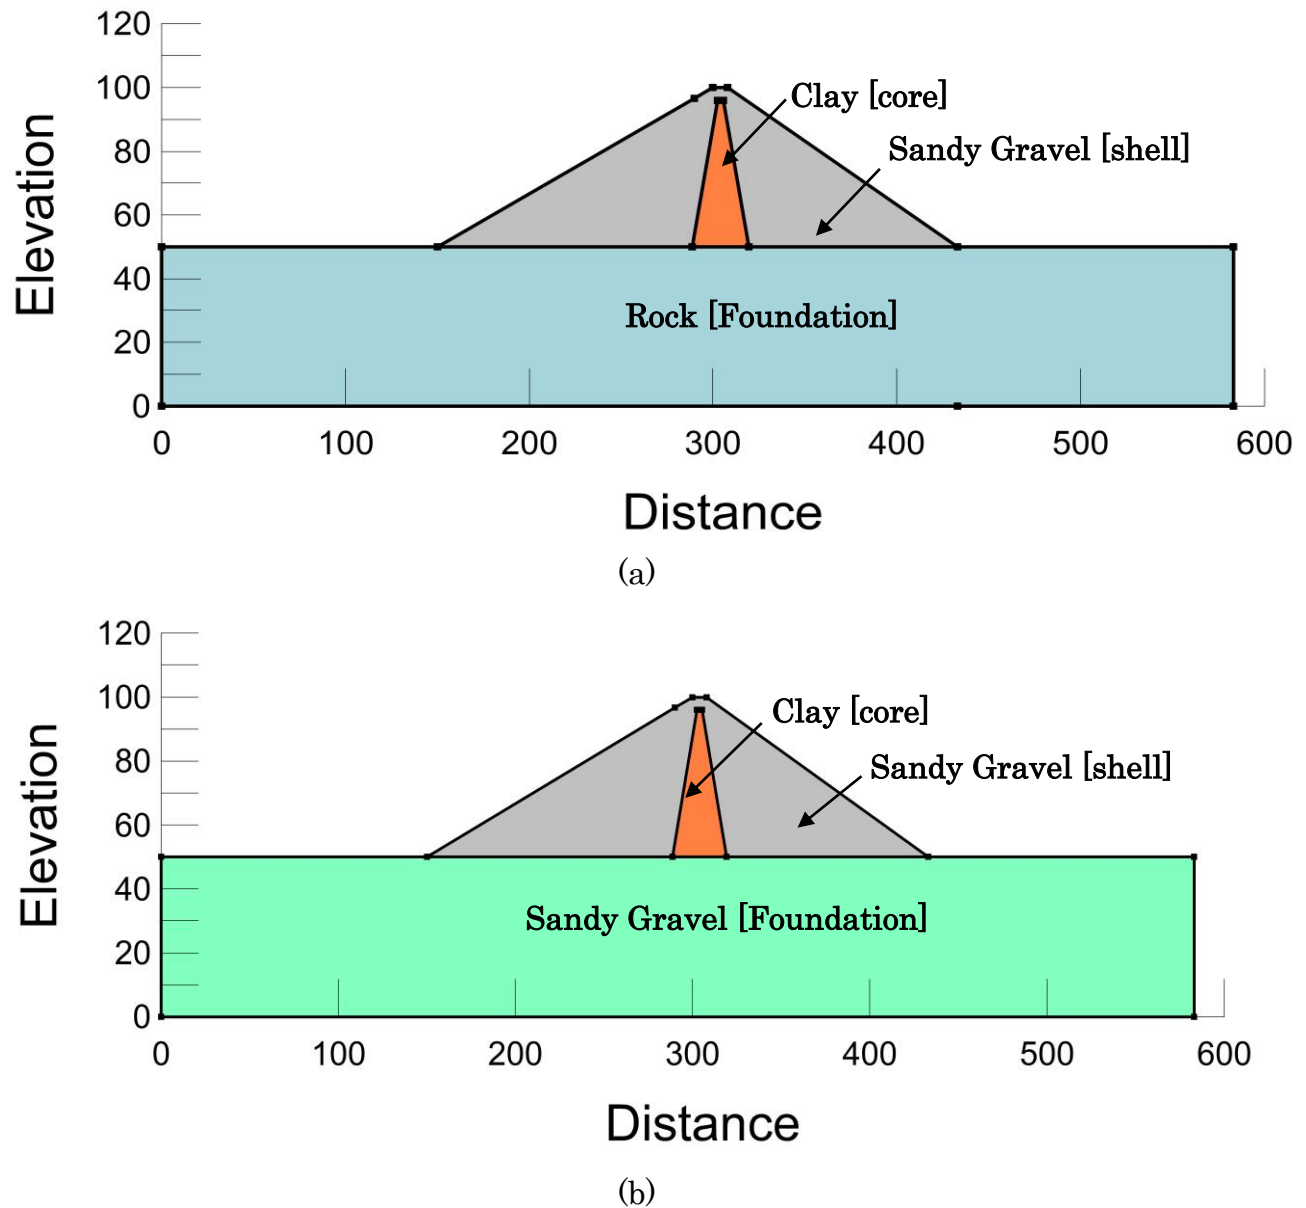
Model of dam cross-section on, (a) Rock foundation, (b) Sandy gravel foundation
